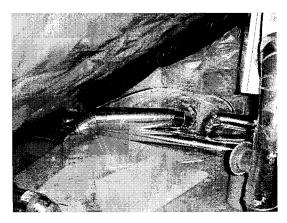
,005.jpg</u>, shows view of conditioned attic storage space prior to installation of system. Note ducts previously used by the HRV can be seen following the roof profile.
